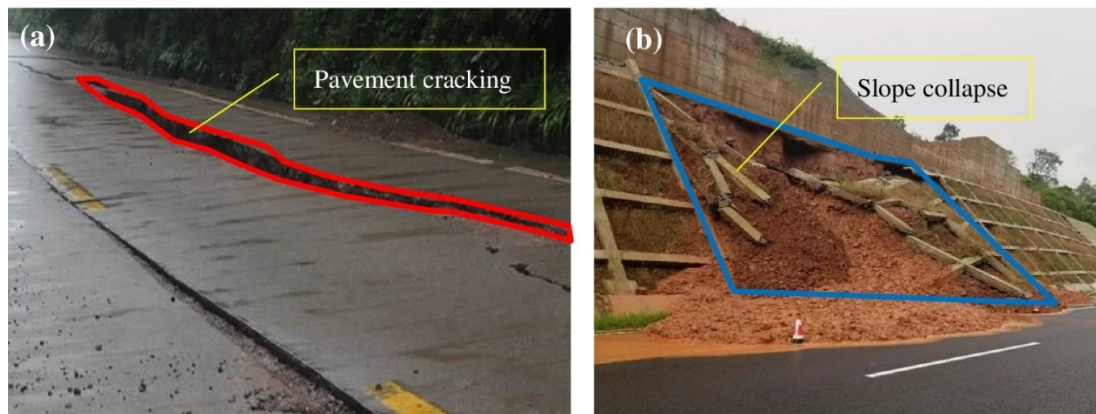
Failure of highway embankment and slaking problem of mudstone in Japan
